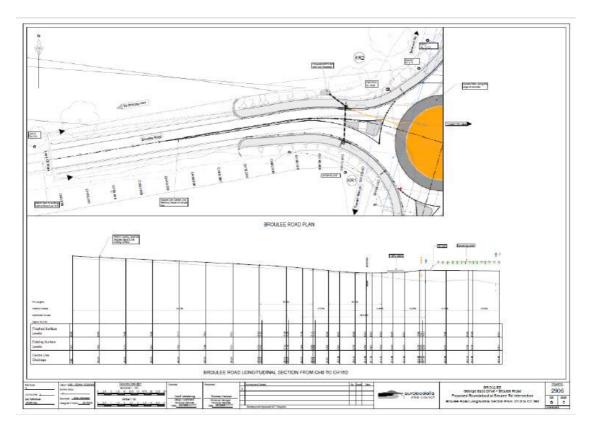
Plan of roundabout showing scope of works for Broulee Road (West).
